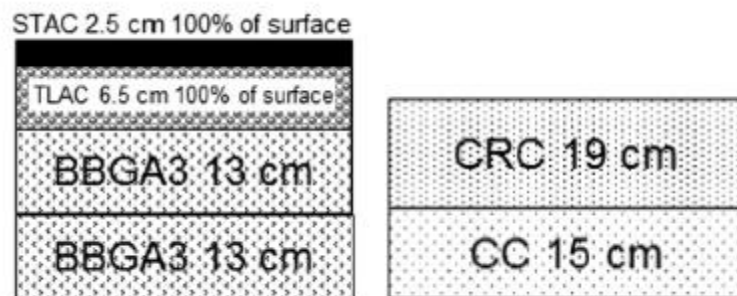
Layer composition of road pavement in *Jullien et al.* [40]
